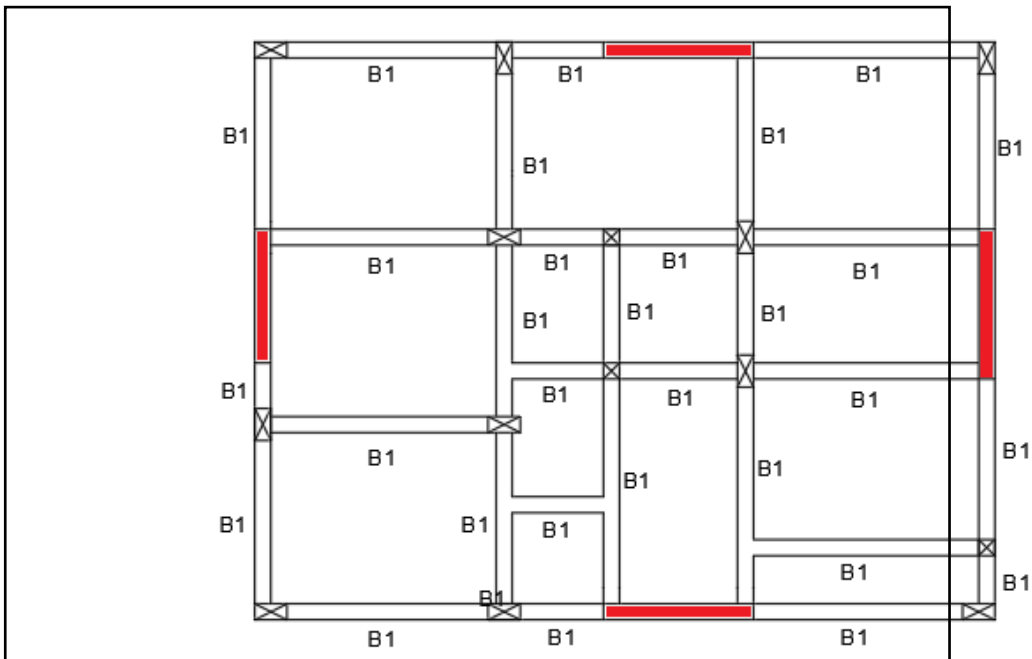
Shear Wall at middle along periphery of structure Auto-Cadd Plan
